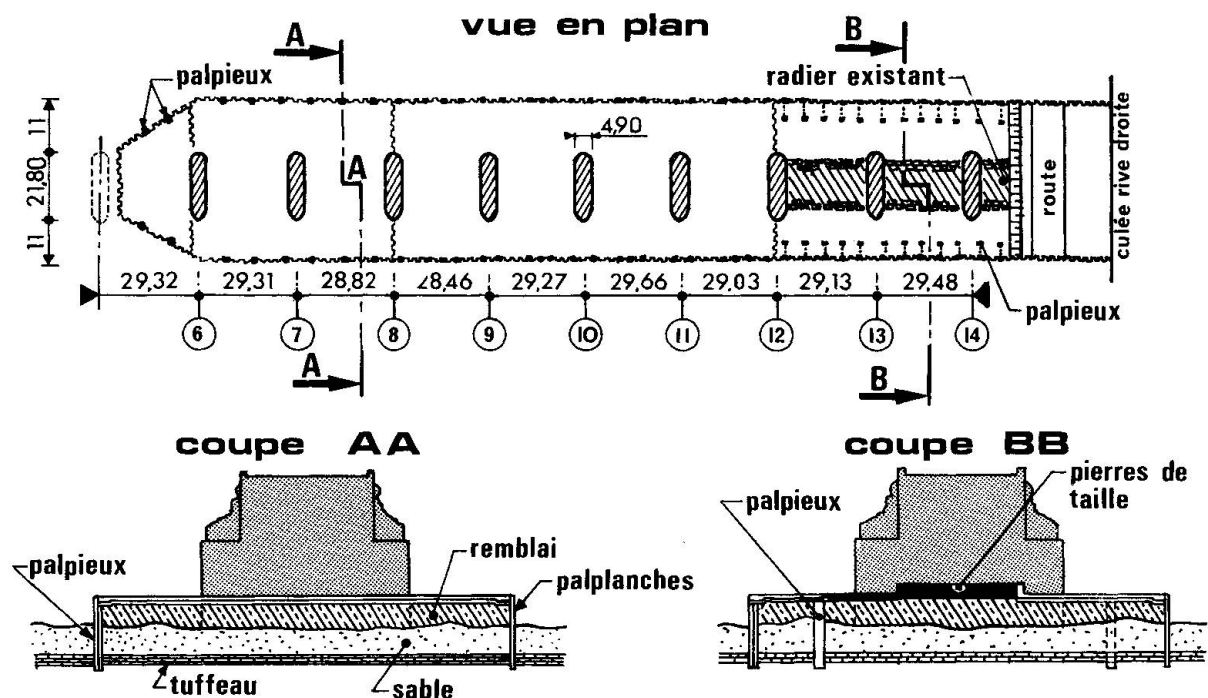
Drawing of the general cofferdam ensuring final strengthening of foundations.
